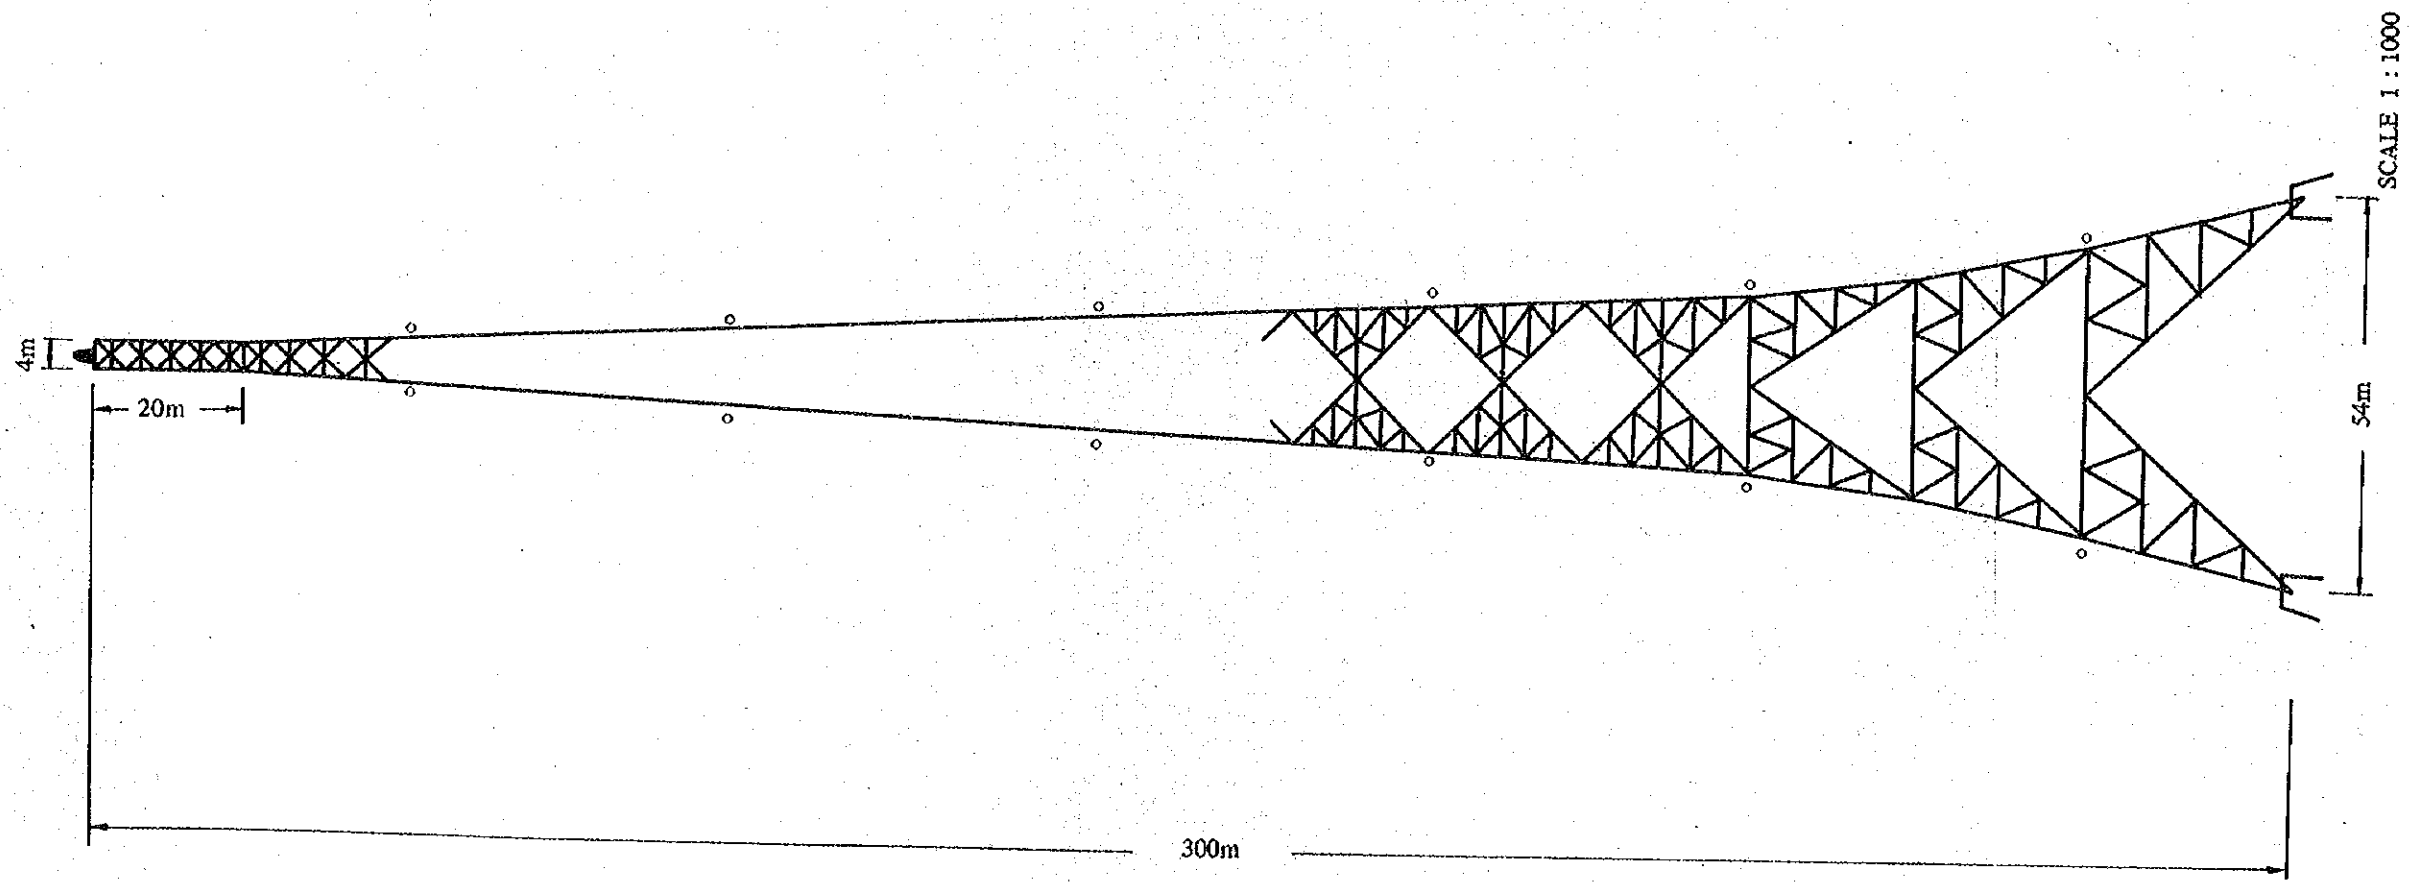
Plan of Self-Supported Tower (300m Height)
